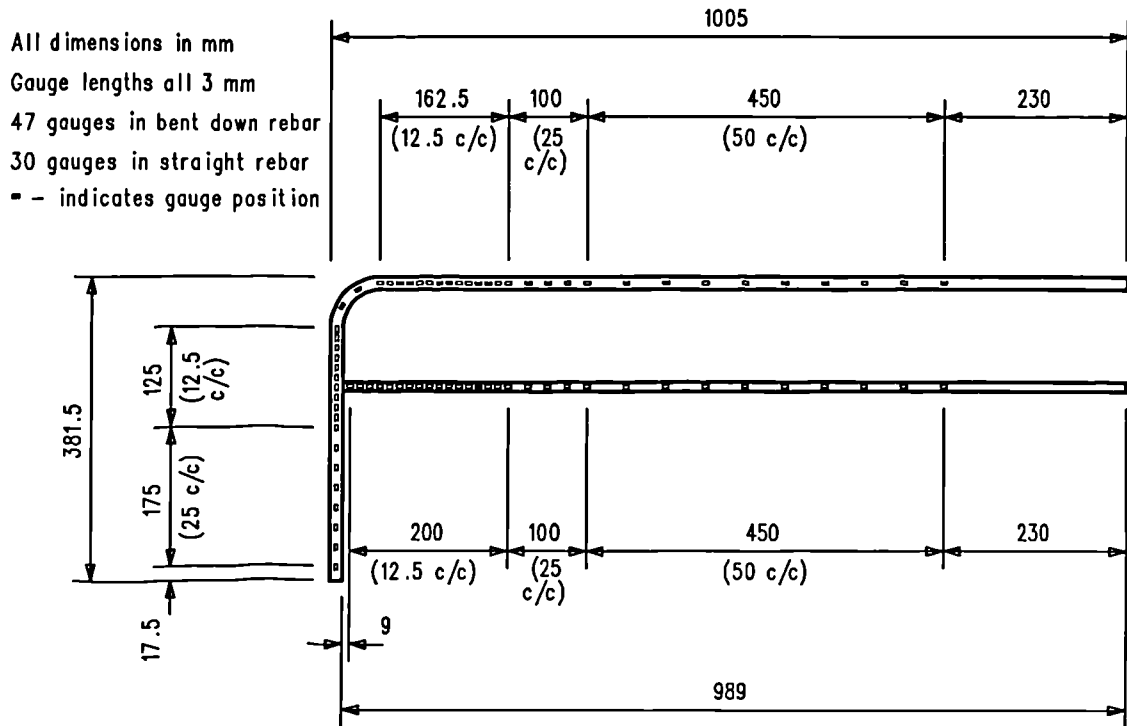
Beam bent down and compression rebar - strain gauge layout
